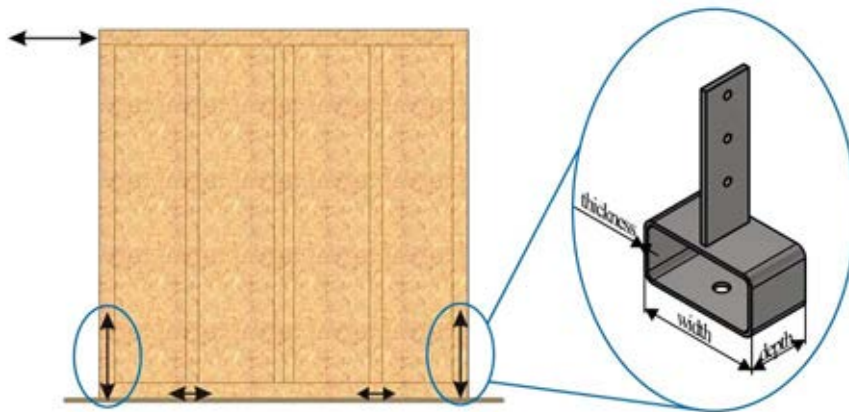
Innovative ductile and replaceable anchorage for timber shear walls
